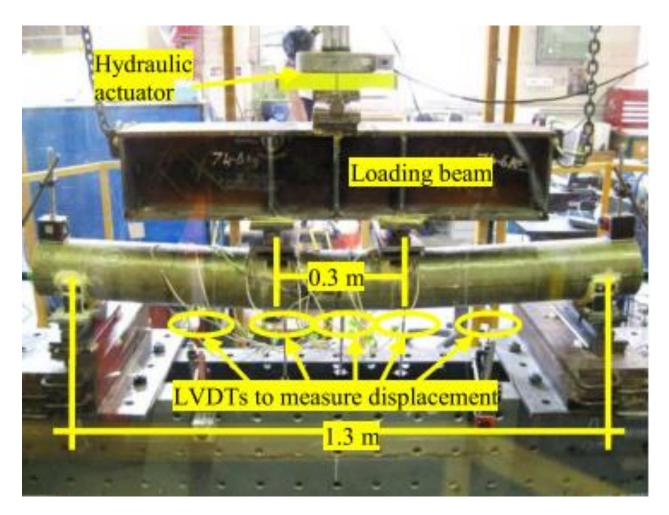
Four Point Loading of Hybrid-CFDST beams [28]
